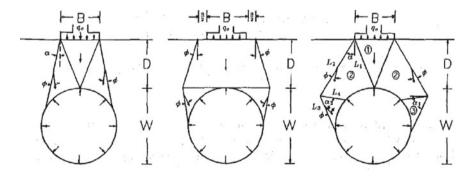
Failure mechanism of footing collapse [10]
